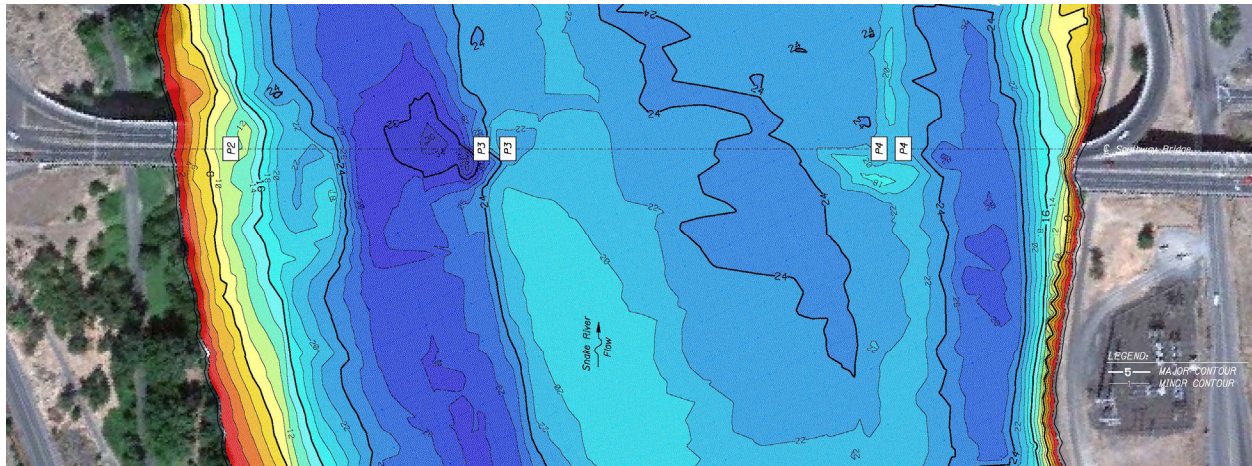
Typical single-beam hydrographic survey plan of a bridge site.
